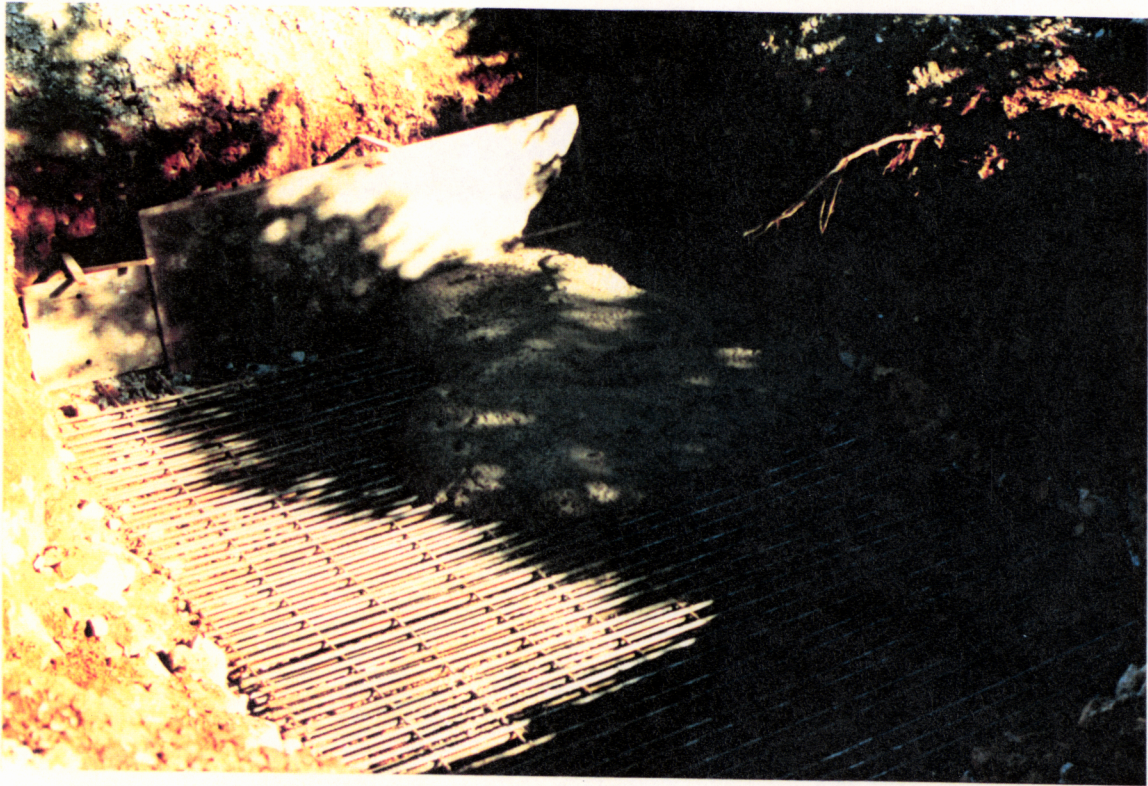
Beginning of concrete pour for No. 1 Raise monolithic slab.
